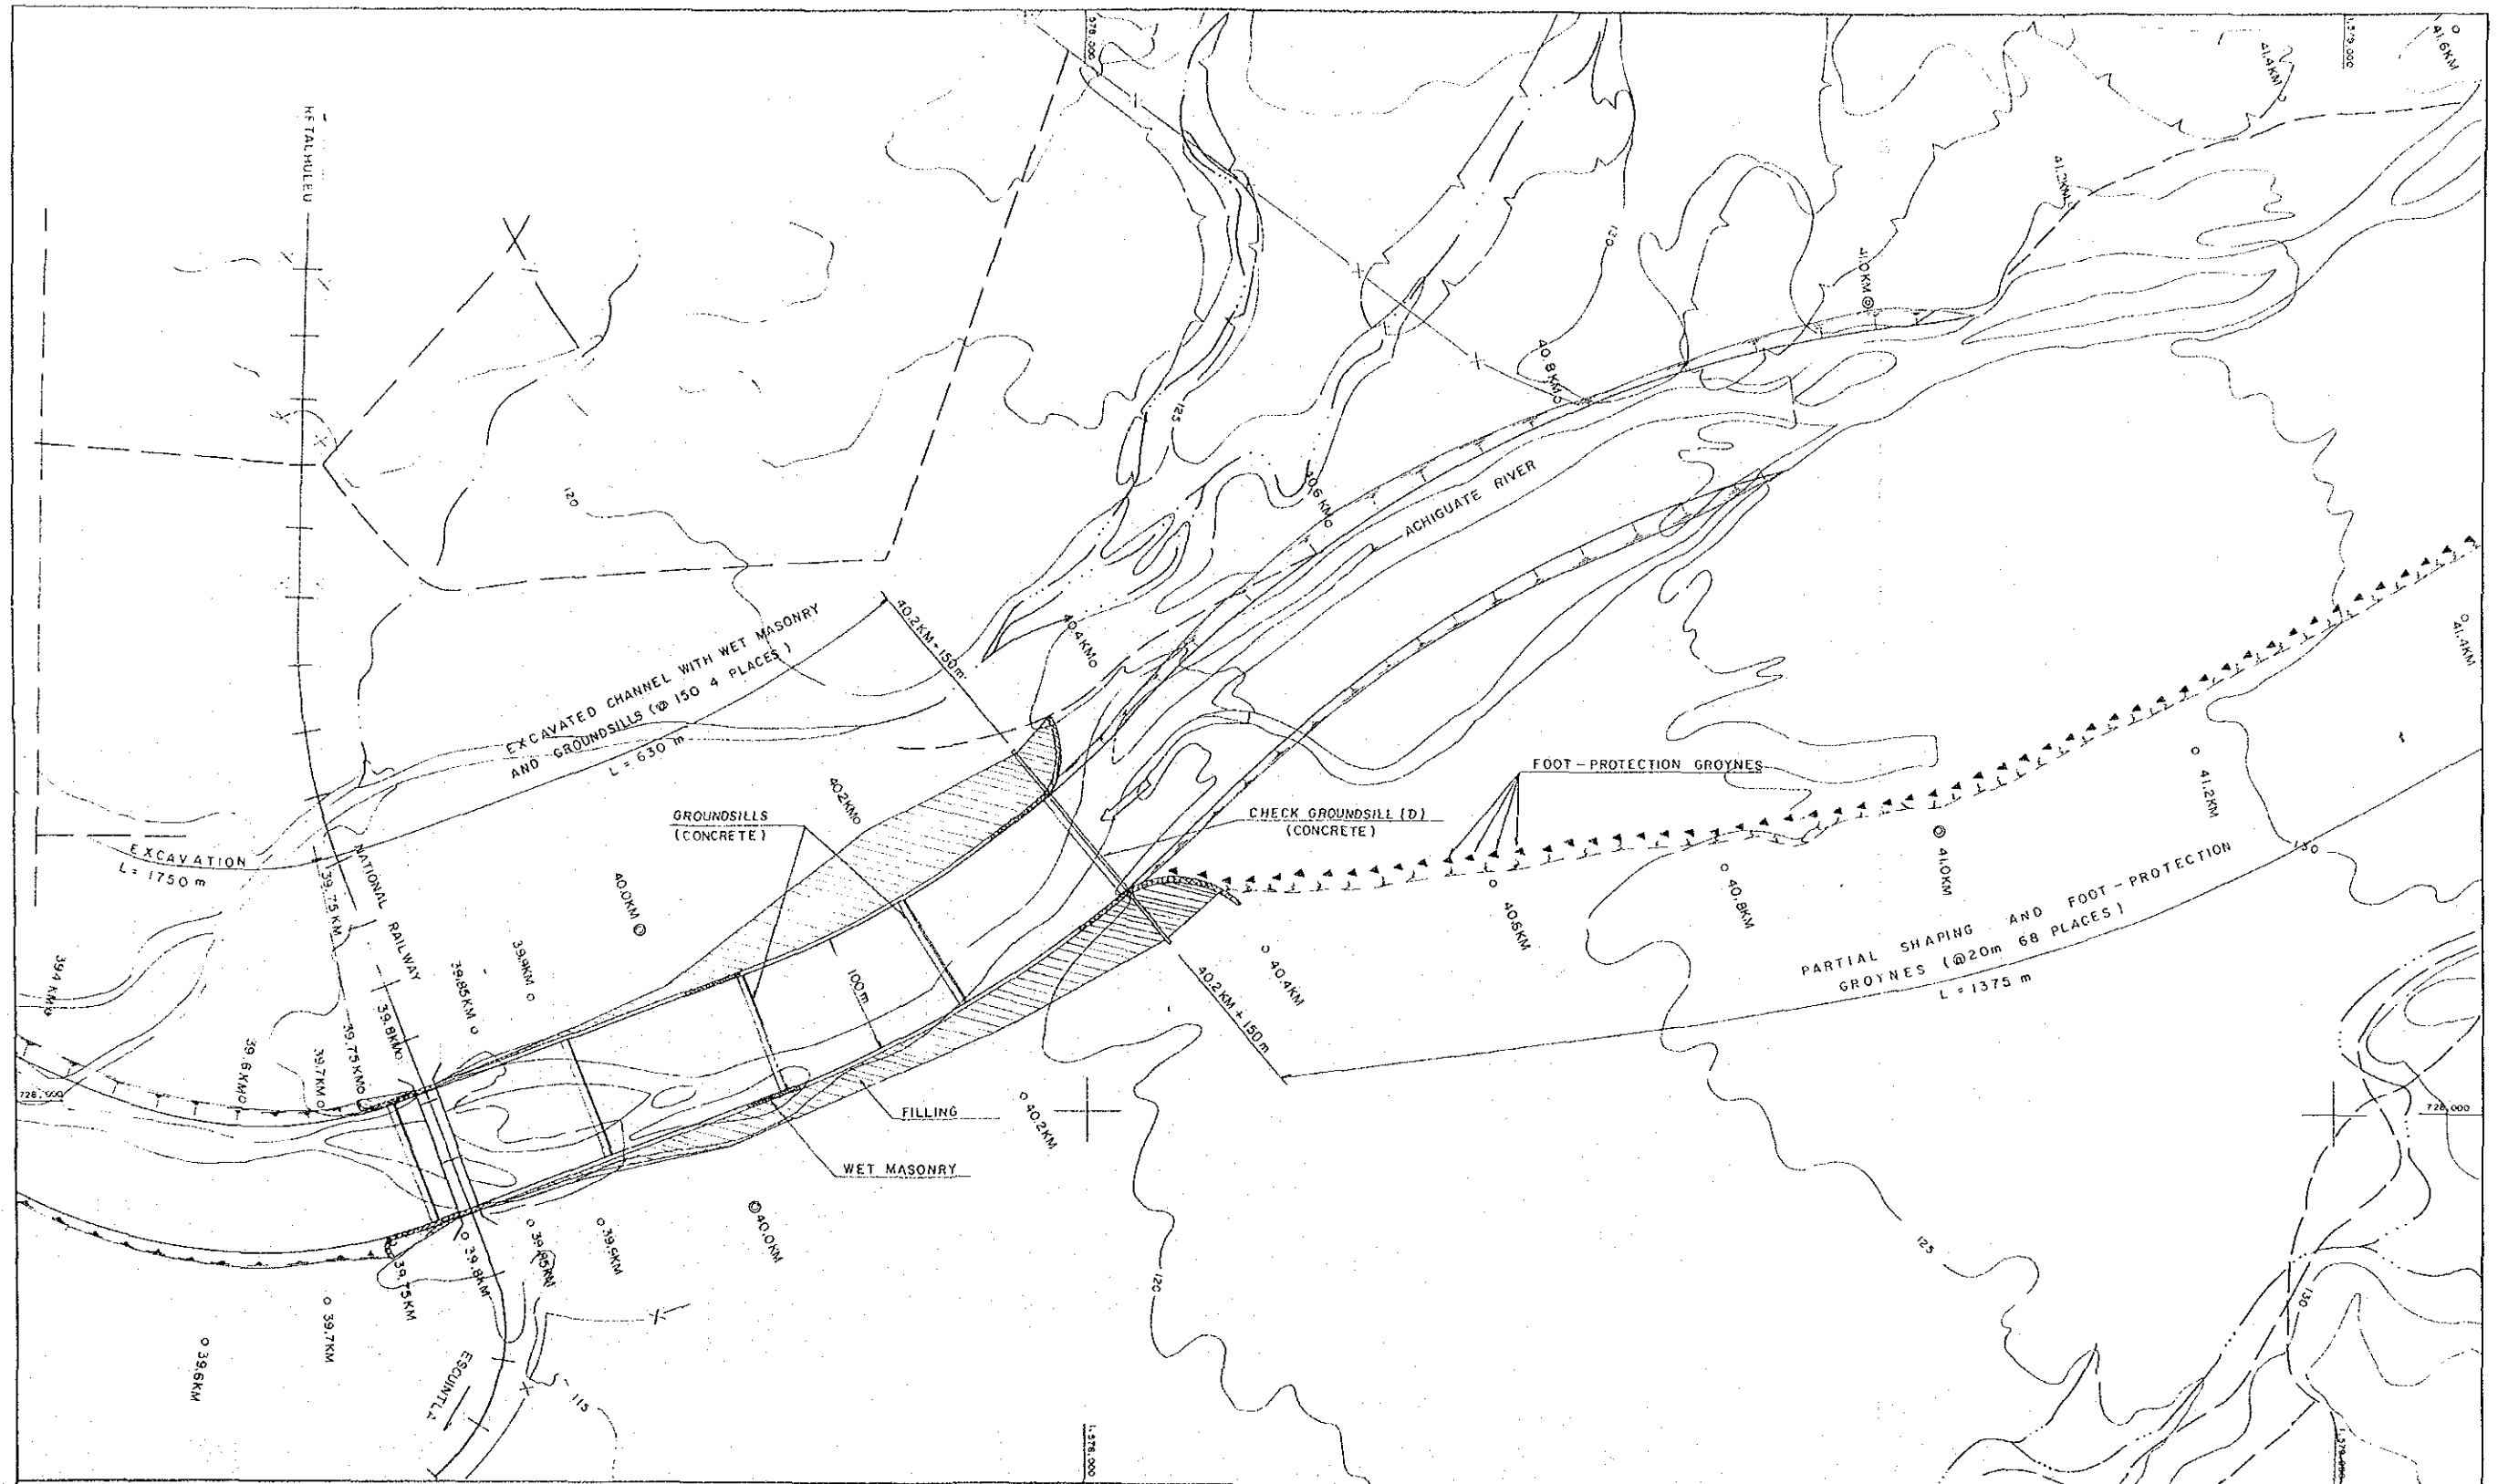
(1/6) PLAN OF RIVER IMPROVEMENT IN THE PROPOSED URGENT PLAN (ACHIGUATE RIVER)
